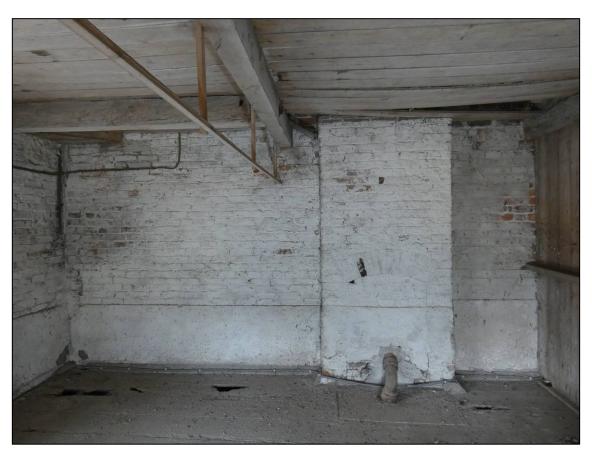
South range, first floor room (1F11), blocked fireplace to north wall, looking NW (photo 1/818).
